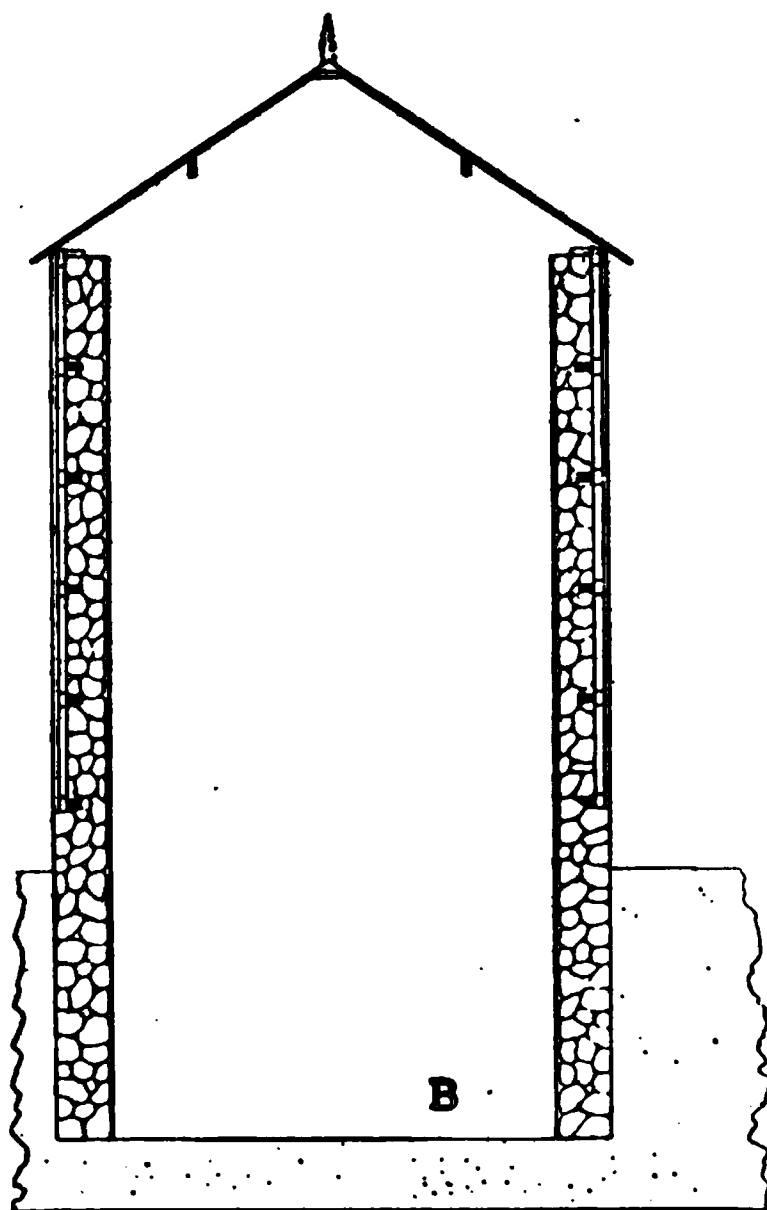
Shows the method of jacketing a stone silo to protect it against frost: the heavy black squares are blocks bedded into the stone wall to which girts or studs may be nailed to carry the siding.
